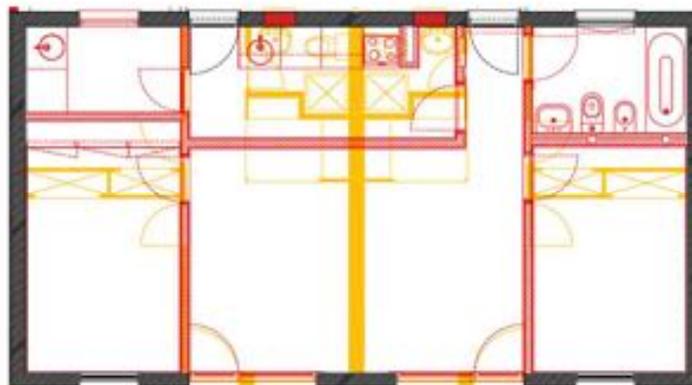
Renovation plans (in yellow demolitions and in red new elements)
